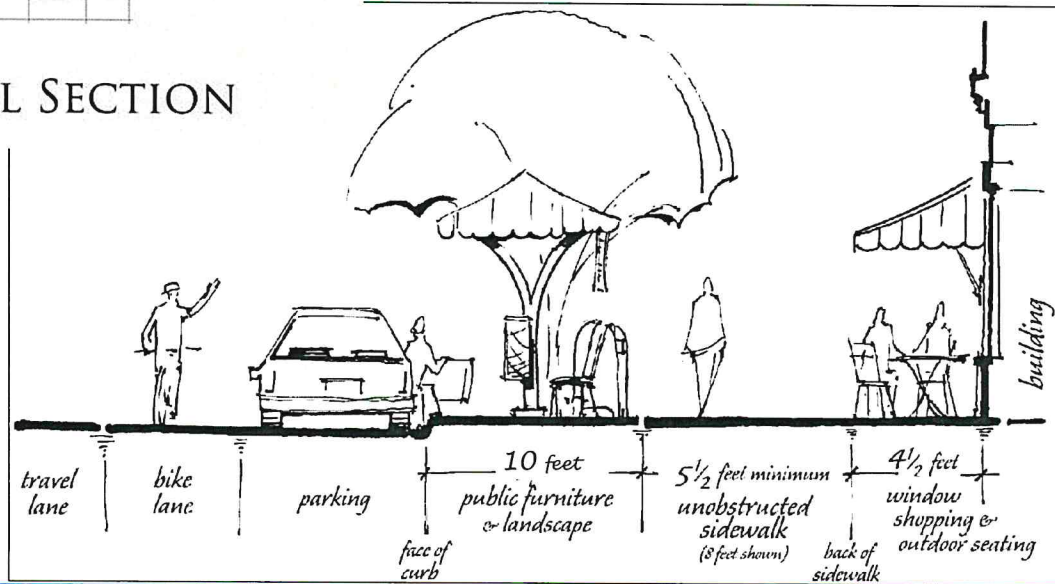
B BROADWAY TYPICAL STREET SECTION
